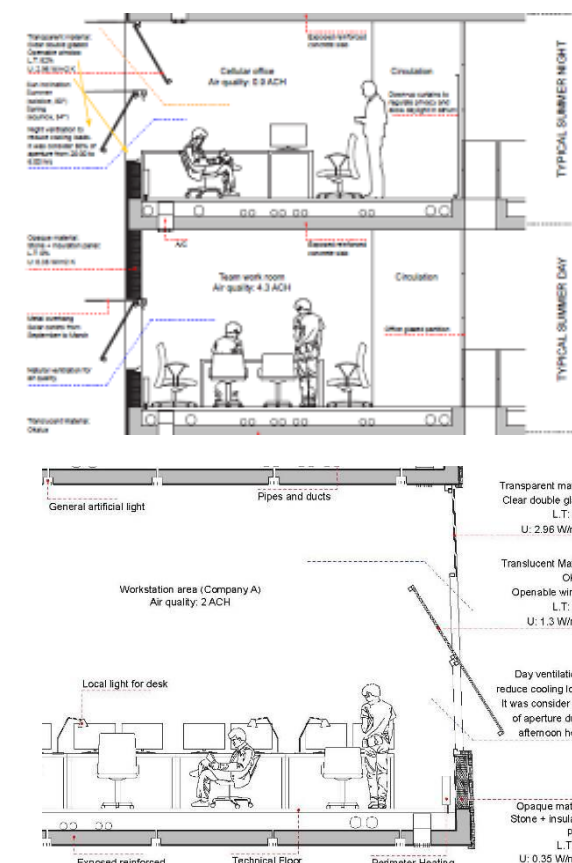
Top - Section of the south-facing cellular offices. Bottom - Section of the north-facing open-plan offices.
